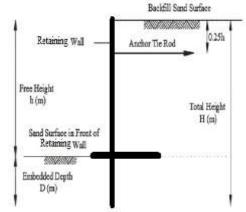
Typical wall section of single anchored retaining wall
